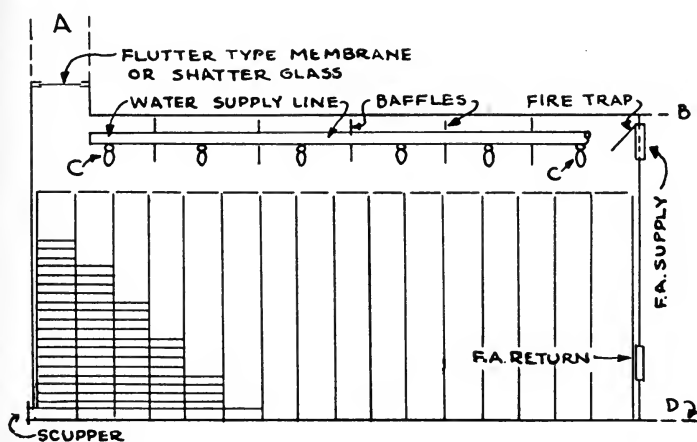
Side-view elevation. A, flue to exterior; B, ceiling or roof line; C, sprinkler heads; D, floor.
